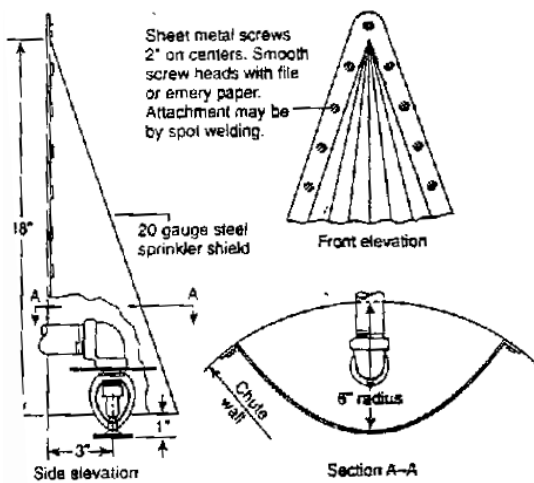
Canopy for protecting sprinklers in building service areas.
